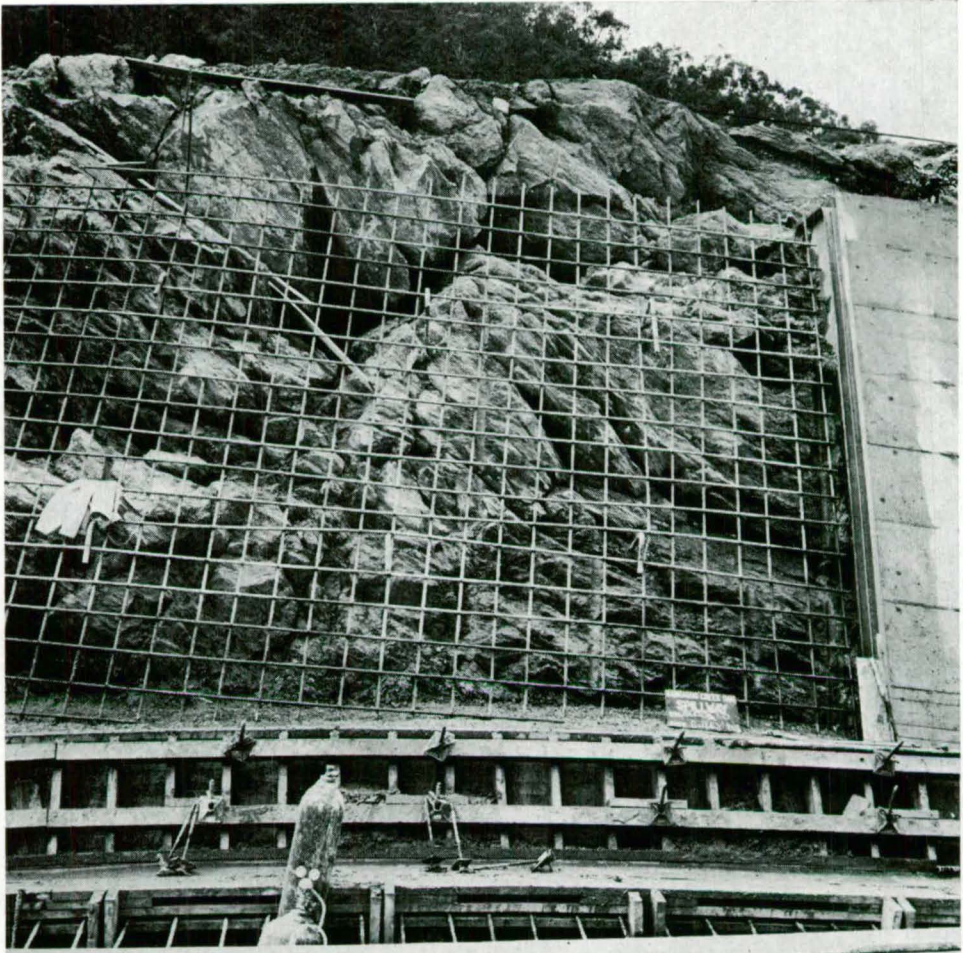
Spillway channel, north wall, block LO, with disturbed wedge shaped block in upper part of foundation.
